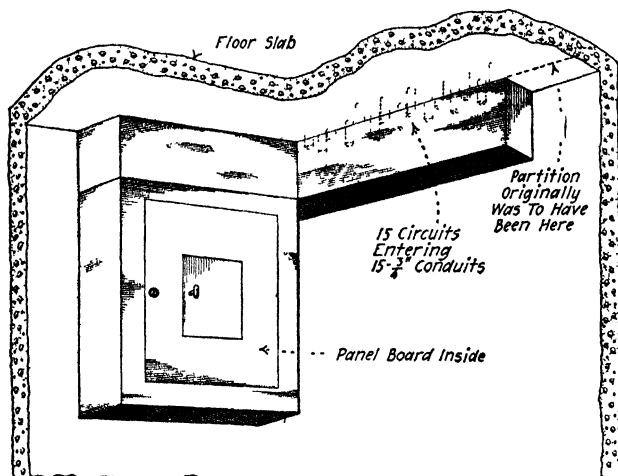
Showing how a cabinet was connected in a building where the cabinet location was changed after the conduit was placed.
